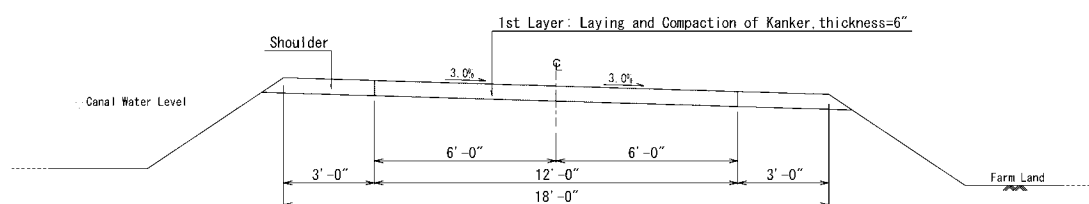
Typical Cross Section of Kanker Pavement (Canal Inspection Road)
